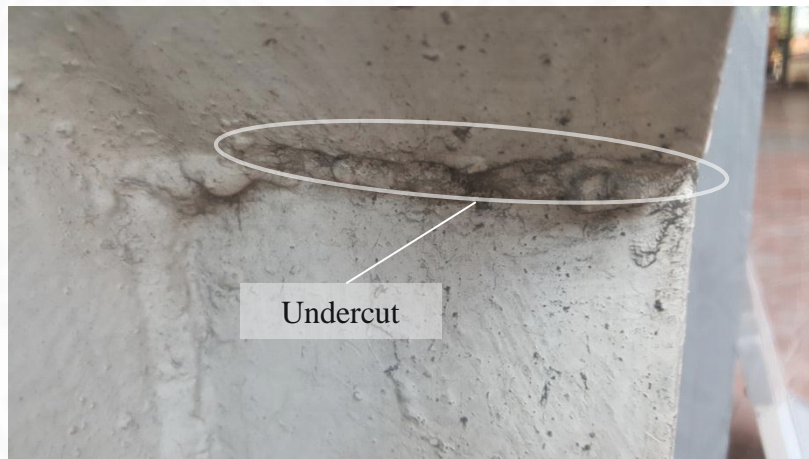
Welding defects on Steel Structure B (joint 6)
